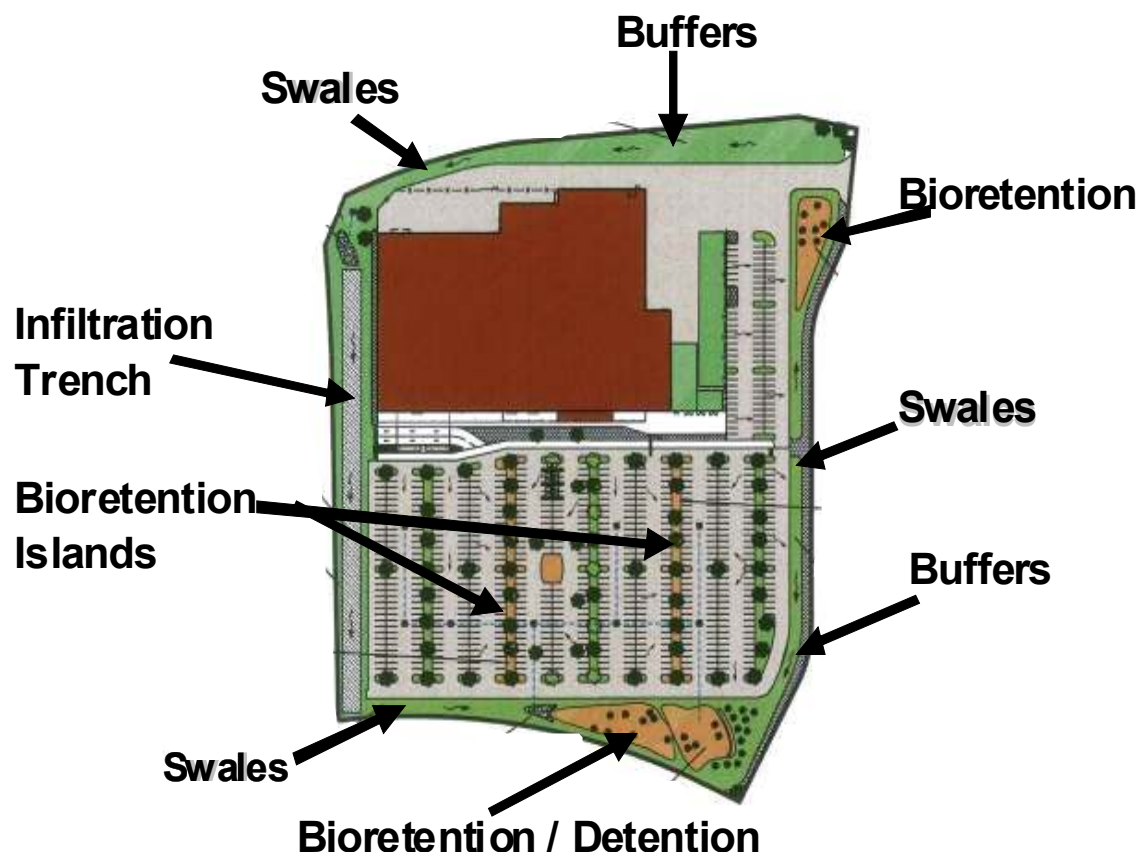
LID Design for a “Big Box” Commercial Site. This figure shows swales, bioretention areas, buffers and infiltration practices. The bioretention islands in the parking lots could be used for filtration, infiltration and volume storage.
